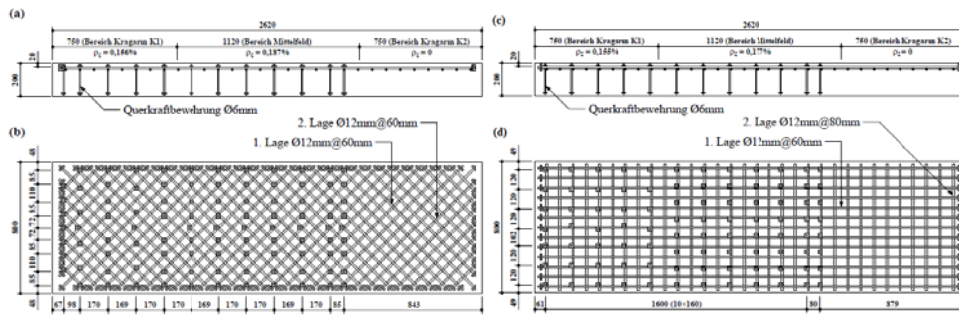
a) Longitudinal section of reinforcement of A4; b) Plan of reinforcement of A4; c) Longitudinal reinforcement of A5; d) Plan of reinforcement of A5, Jaeger (2005).
